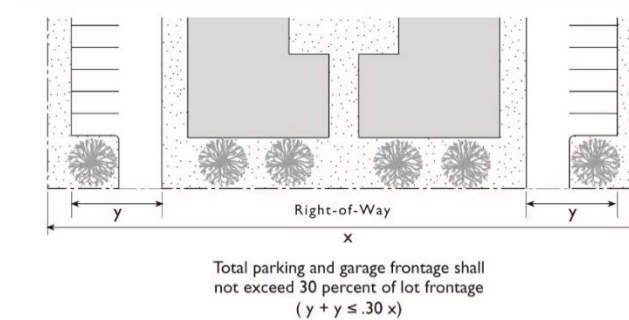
d.1: Parking and Garage Frontage Limitation
